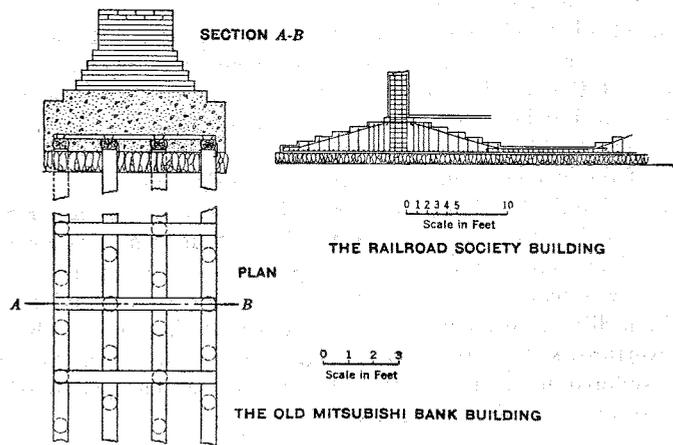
FLOATING FOUNDATION OF RAILROAD SOCIETY BUILDING.
